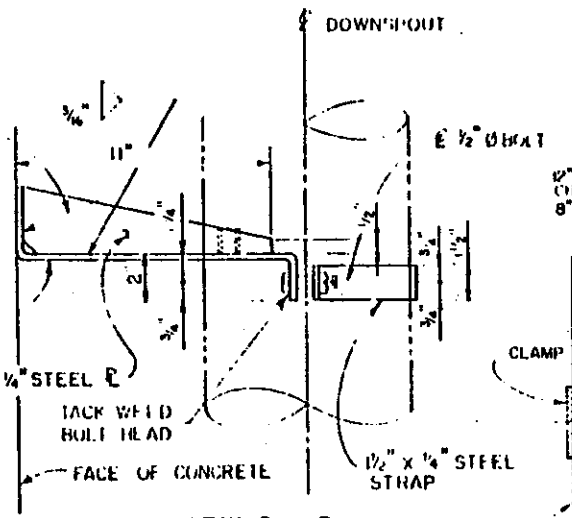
DETAIL OF TOP OF DOWNSPOUT @ PYLONS
